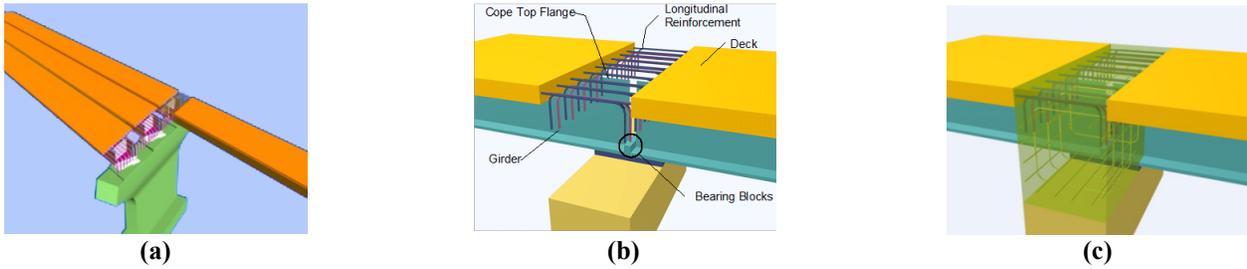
Simple for dead and continuous for live pier detail after the placing of girders (a and b), and after the closure pour (c). (Azizinamini et al. 2008)
